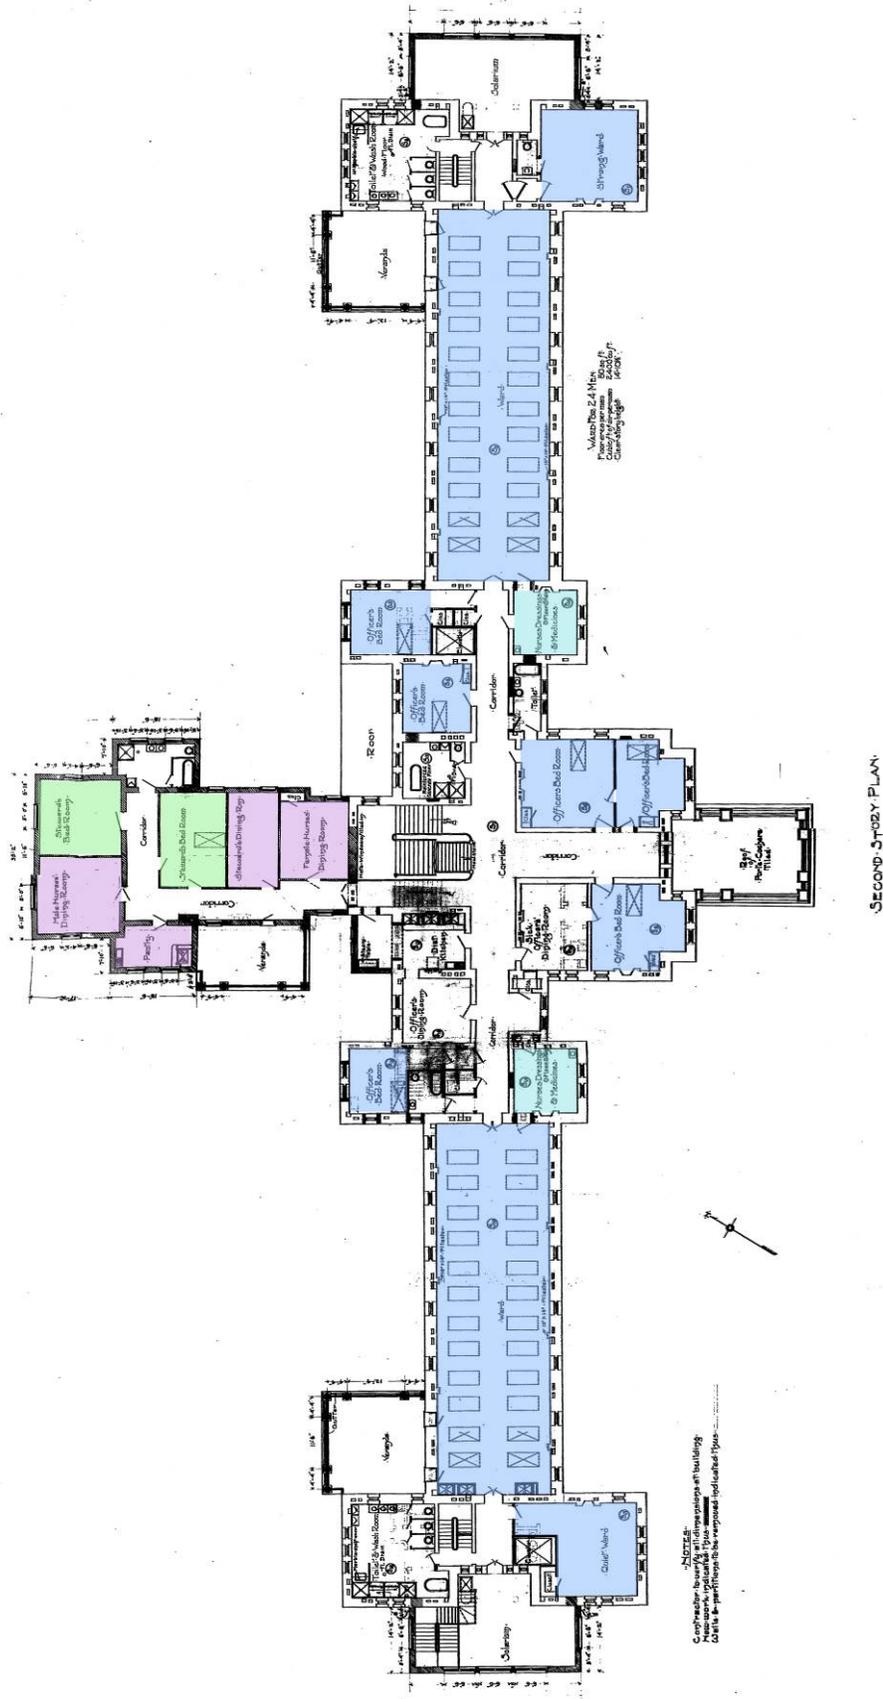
Second floor plan of the second Naval Hospital Philadelphia, Pennsylvania, 1908 (NARA College Park, RG 71 427-31-3).
